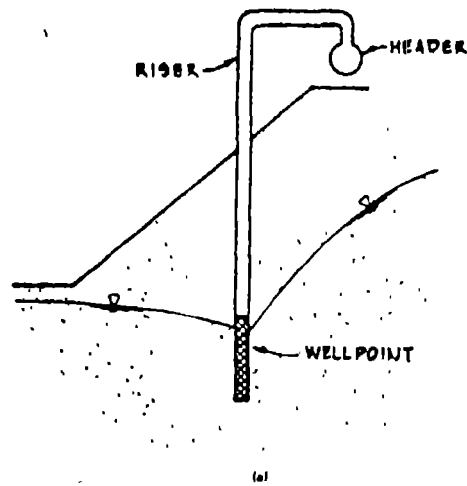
A single stage wellpoint system, showing the header and riser pipes.
